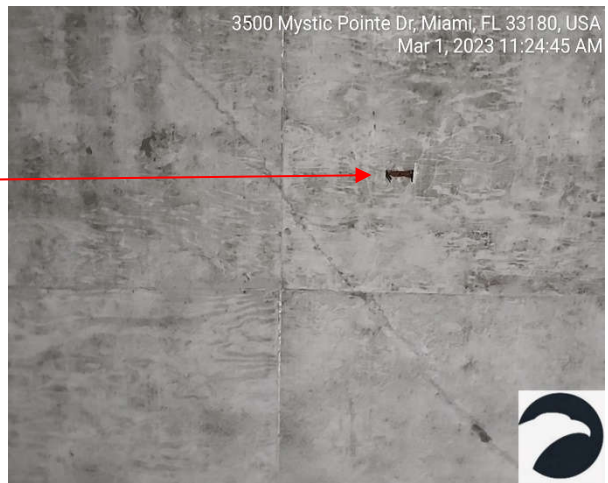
b.22 – Corroded embedded metal at ceiling of the Generator Room (Ground Level)
